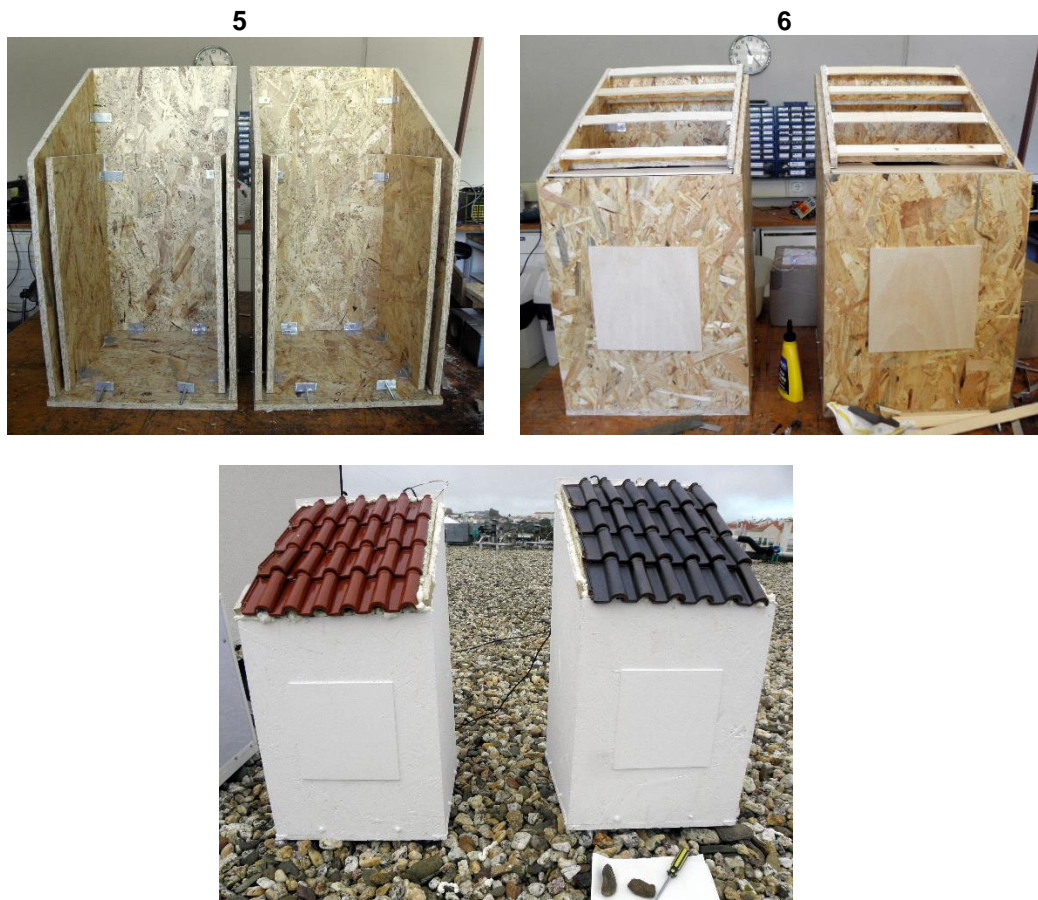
House models in the testing site. The roof on the left has regular tiles, while the roof on the right has "smart" tiles.
